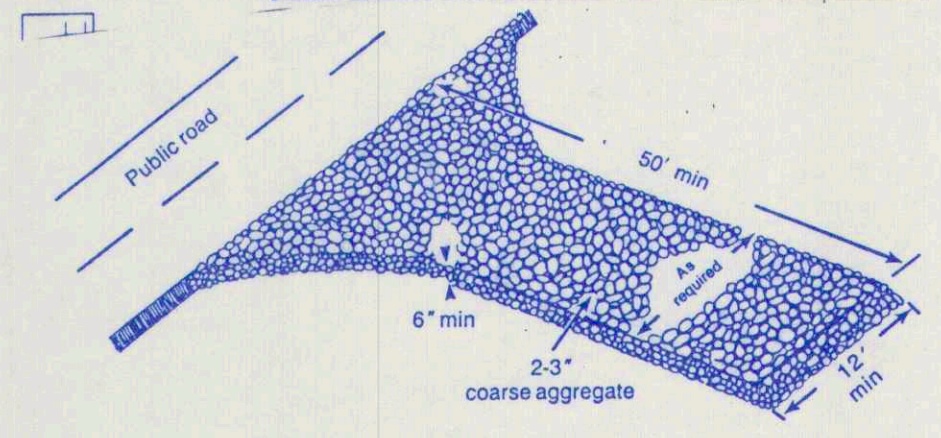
Gravel entrance/exit keeps sediment from leaving the construction site (modified from VA SWCC).
